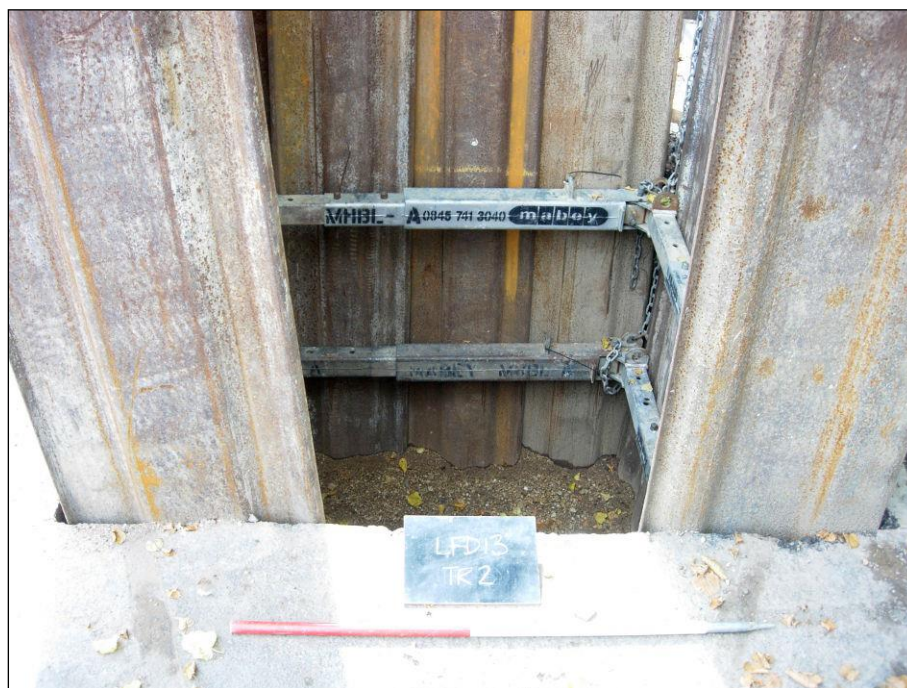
Trench 2 plan, already sheeted, facing south. Scale = 1m.
